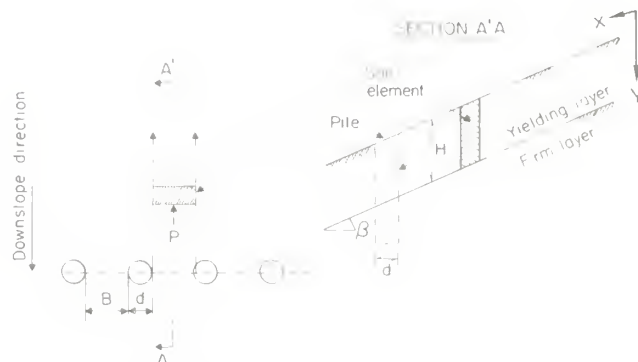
State of plastic deformation and soil arching action around a row of piles (trees) embedded in a slope (from Wang and Yen 1974).
